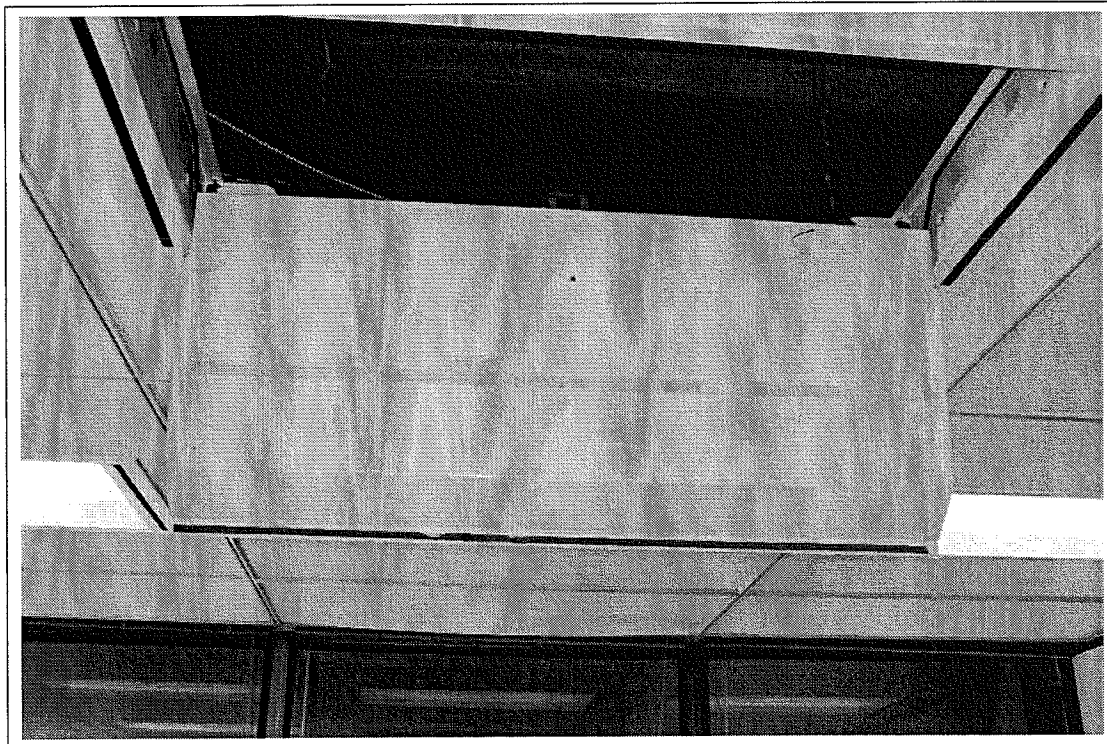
19th floor, room SE1952B - View of fine dust layer on back of fluorescent light fixture
